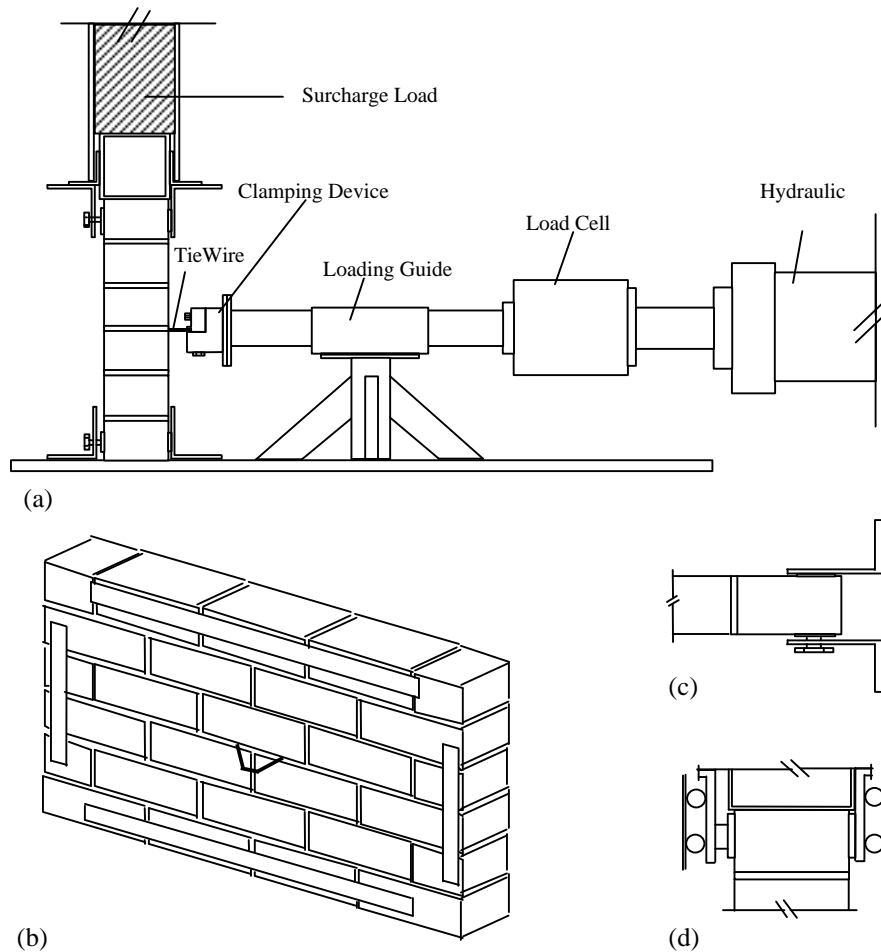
Experimental apparatus: (a) elevation, (b) typical brick panel specimen with edge restraint plates, (c) details of edge restrain along sides and bottom, (d) details of edge restraint along top for specimen with high surcharge
